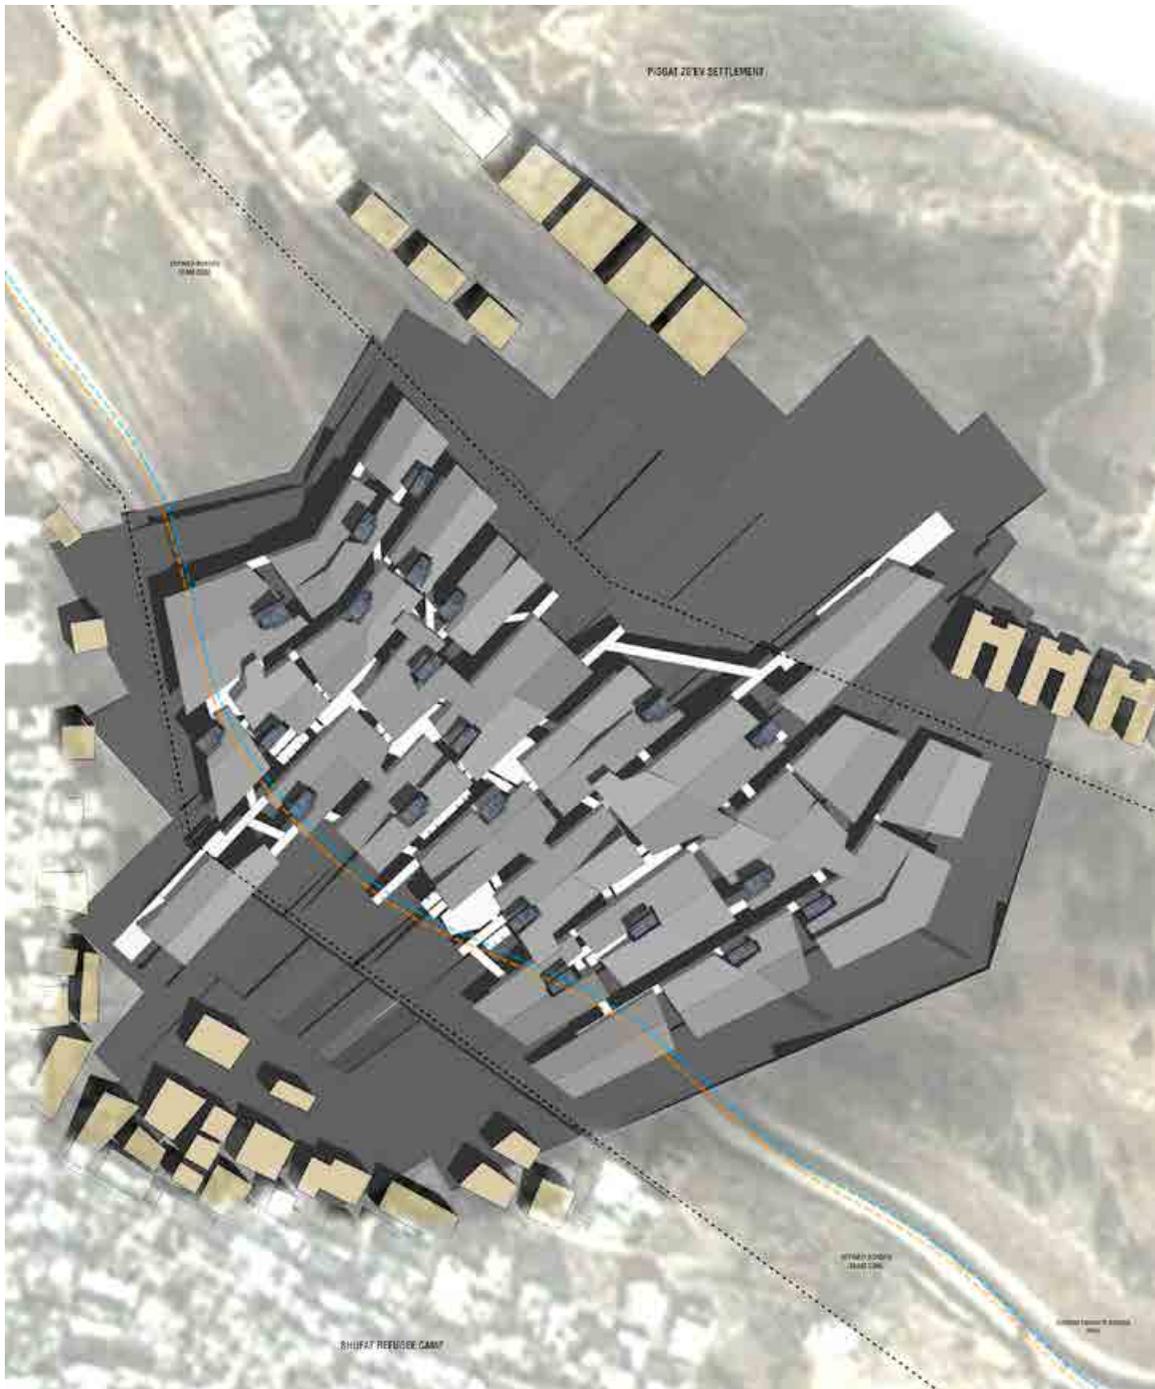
Site plan, facility at the Pisgat Ze'ev - Shufat seam zone, image by author.
